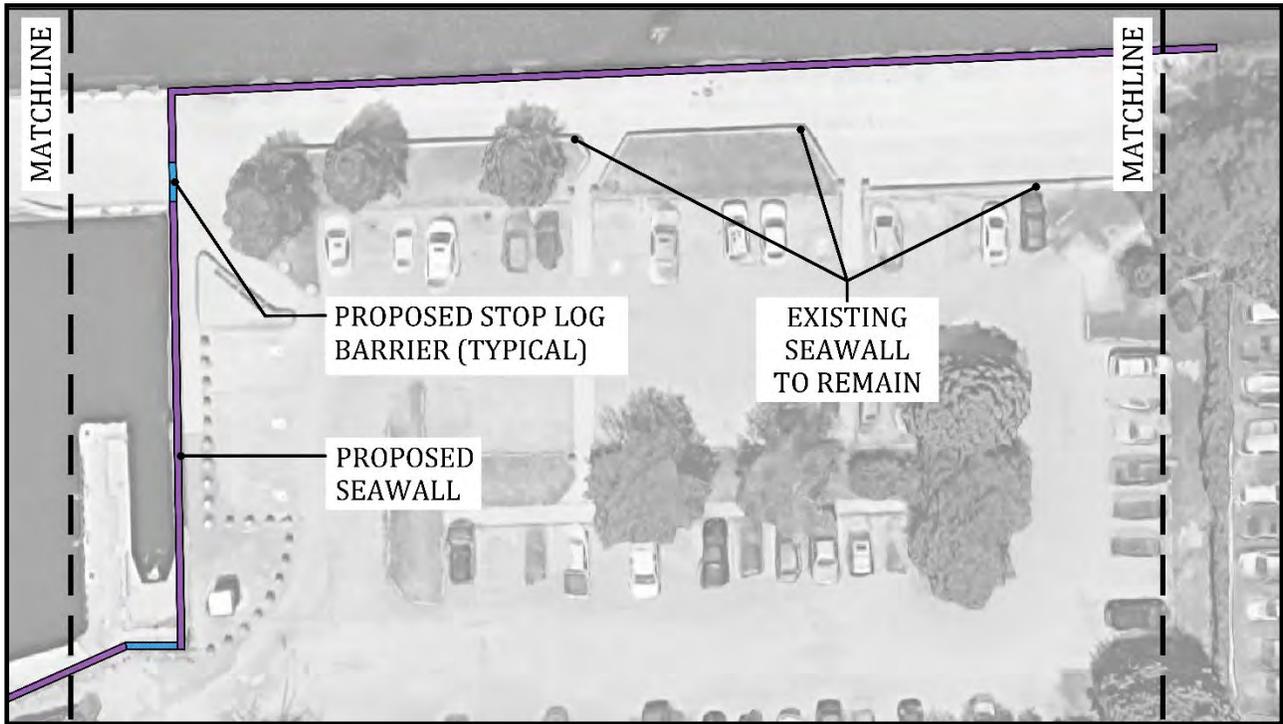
Seawall Concept Plan B: NYS-DEC Fishing Access Area
